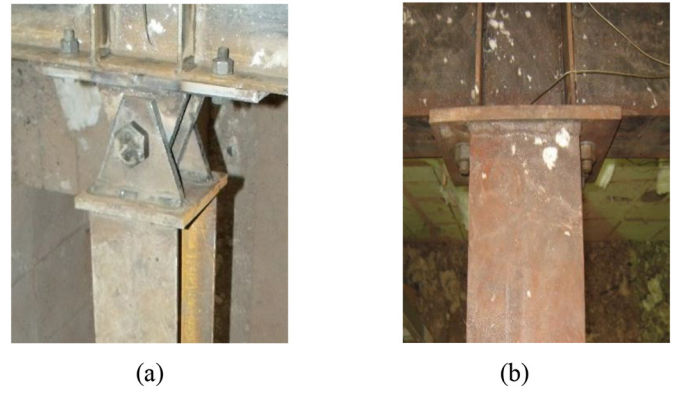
Connection between column specimen and restraining beam. (a) Hinged connection (b) Extended end-plate connection.
